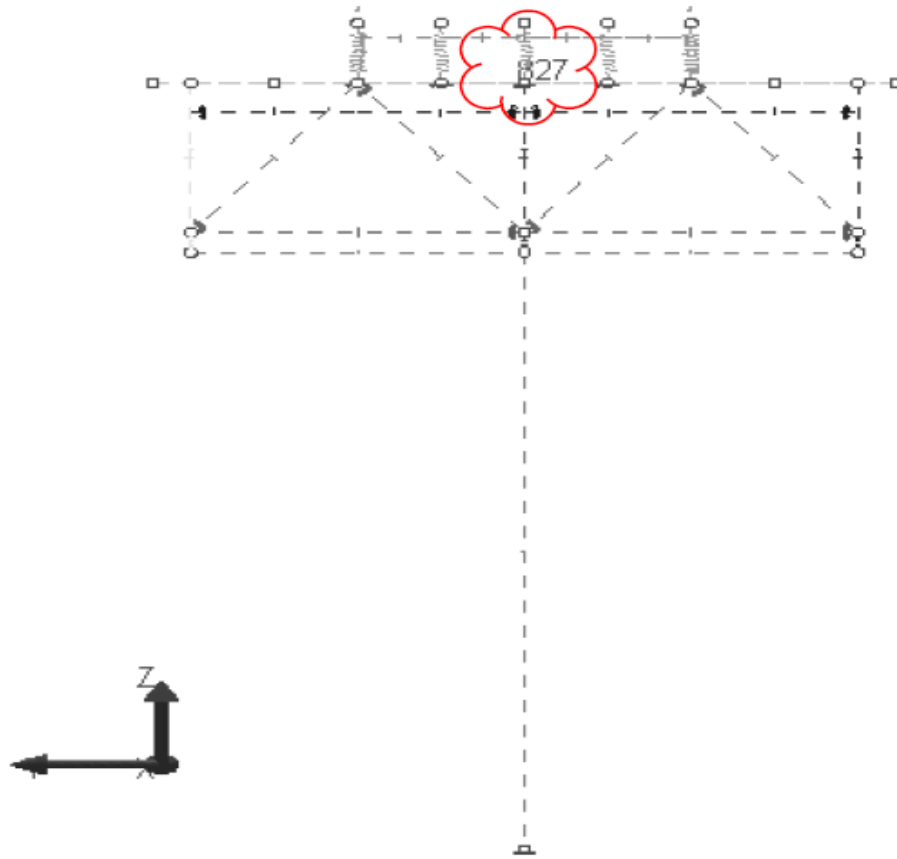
Vertical Cross-section of Bridge Model for 24.5 m Span Length
